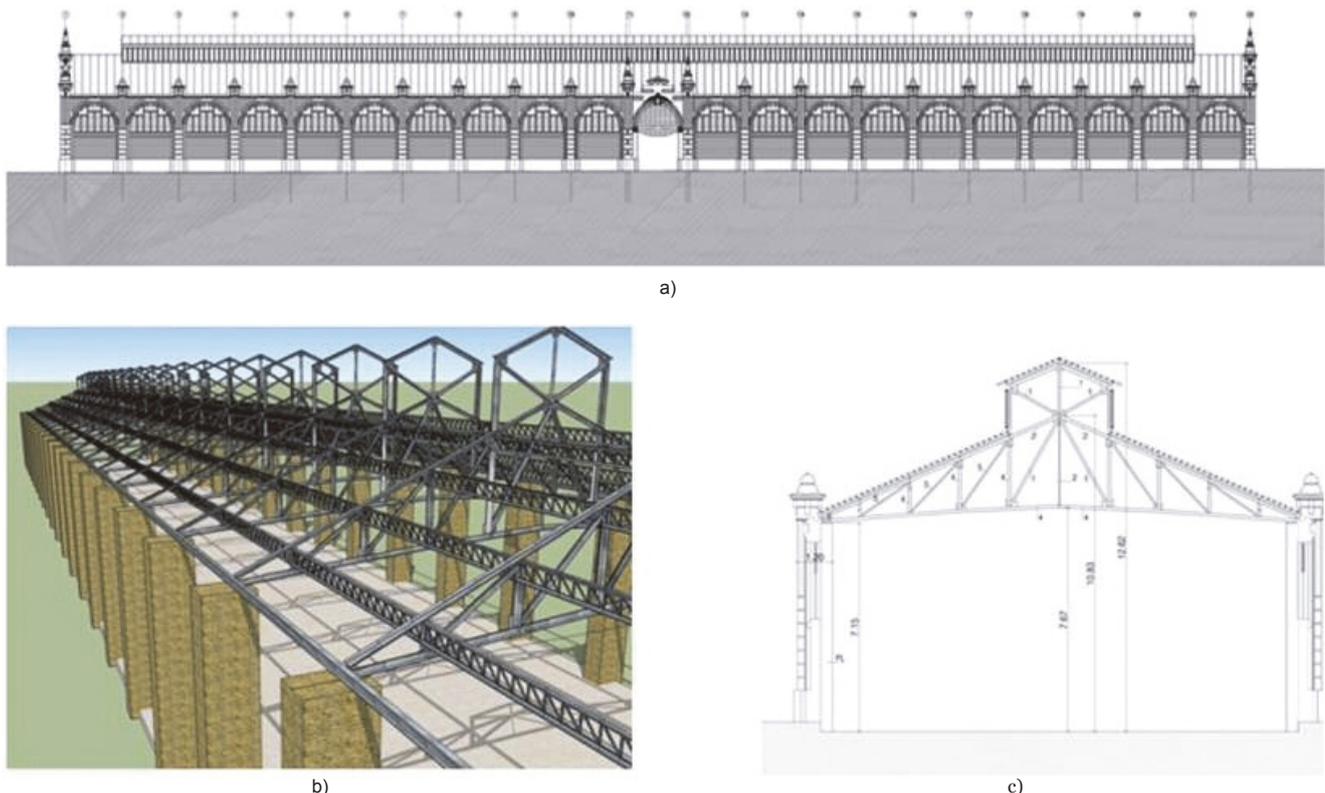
Original structure: a) Lateral view of the market; adapted from (10); b) 3D modelled detail of longitudinal stiffeners; c) Elevation view; adapted from (10).
